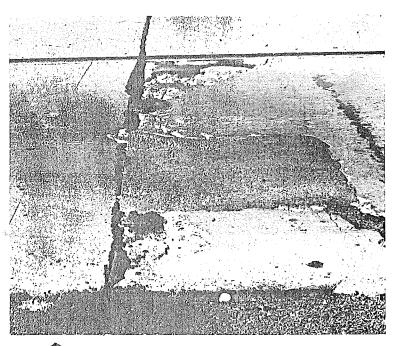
Patch. In an area less than a full lane in width, (a) the covering over with or without removal of the existing pavement, or (b) removal and replacement of all the existing pavement, with portland cement concrete, bituminous concrete, tar and chip mix, or other materials.
